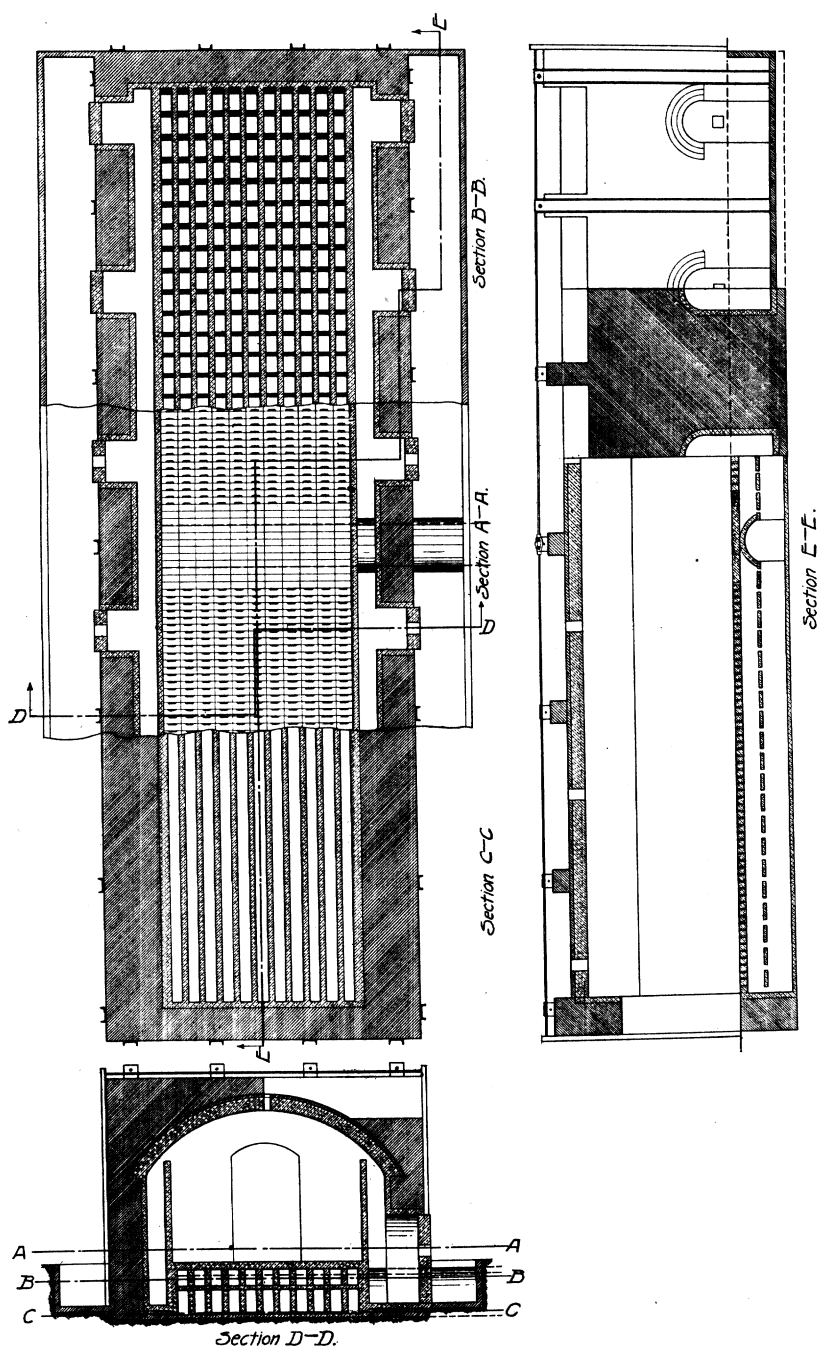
Mitchell Kiln in Use at Detroit Roofing Tile Co., Detroit, Mich.
